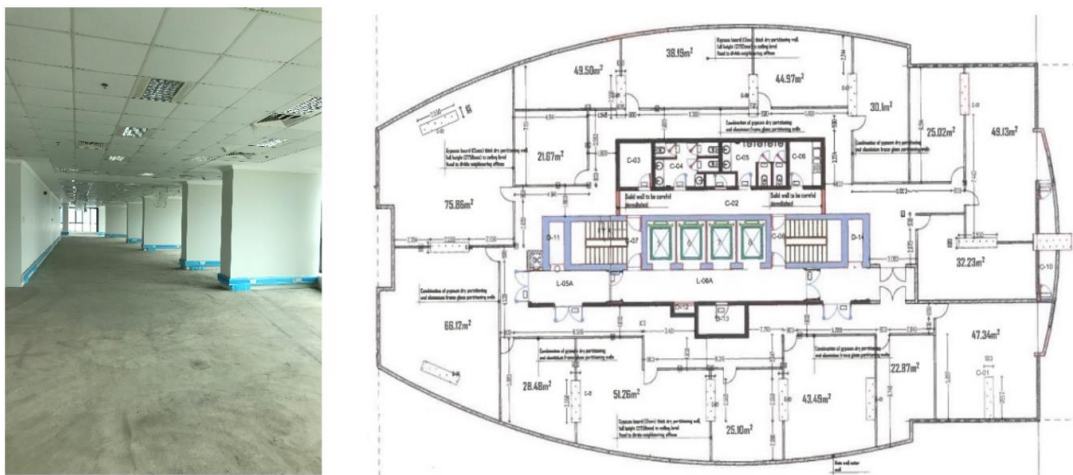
Functional layout of the PSSSF twin towers; Left: Interior image of an unoccupied office space; Right: Office floor layout plan showing first attempt to subdivision of office space for rent. (Source: Author, 2021)
